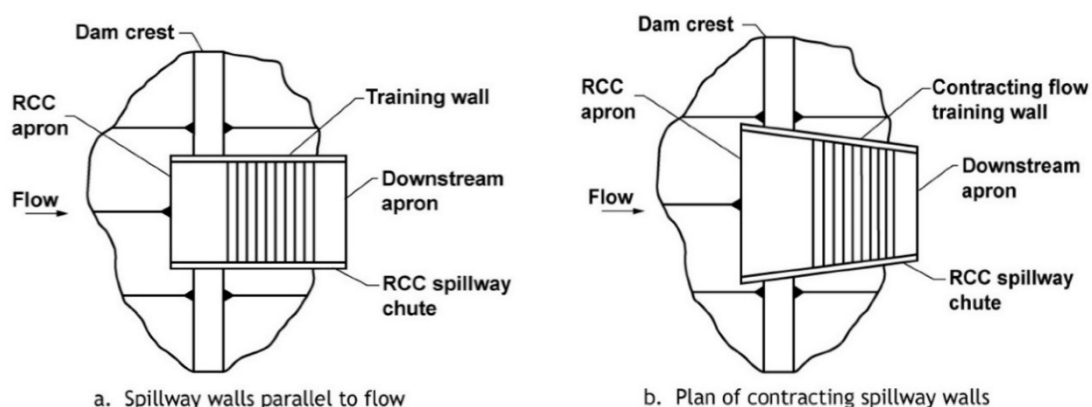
Schematic plan of RCC protection. Left: Parallel side walls. Right: Converging sidewalls (FEMA 2014)
